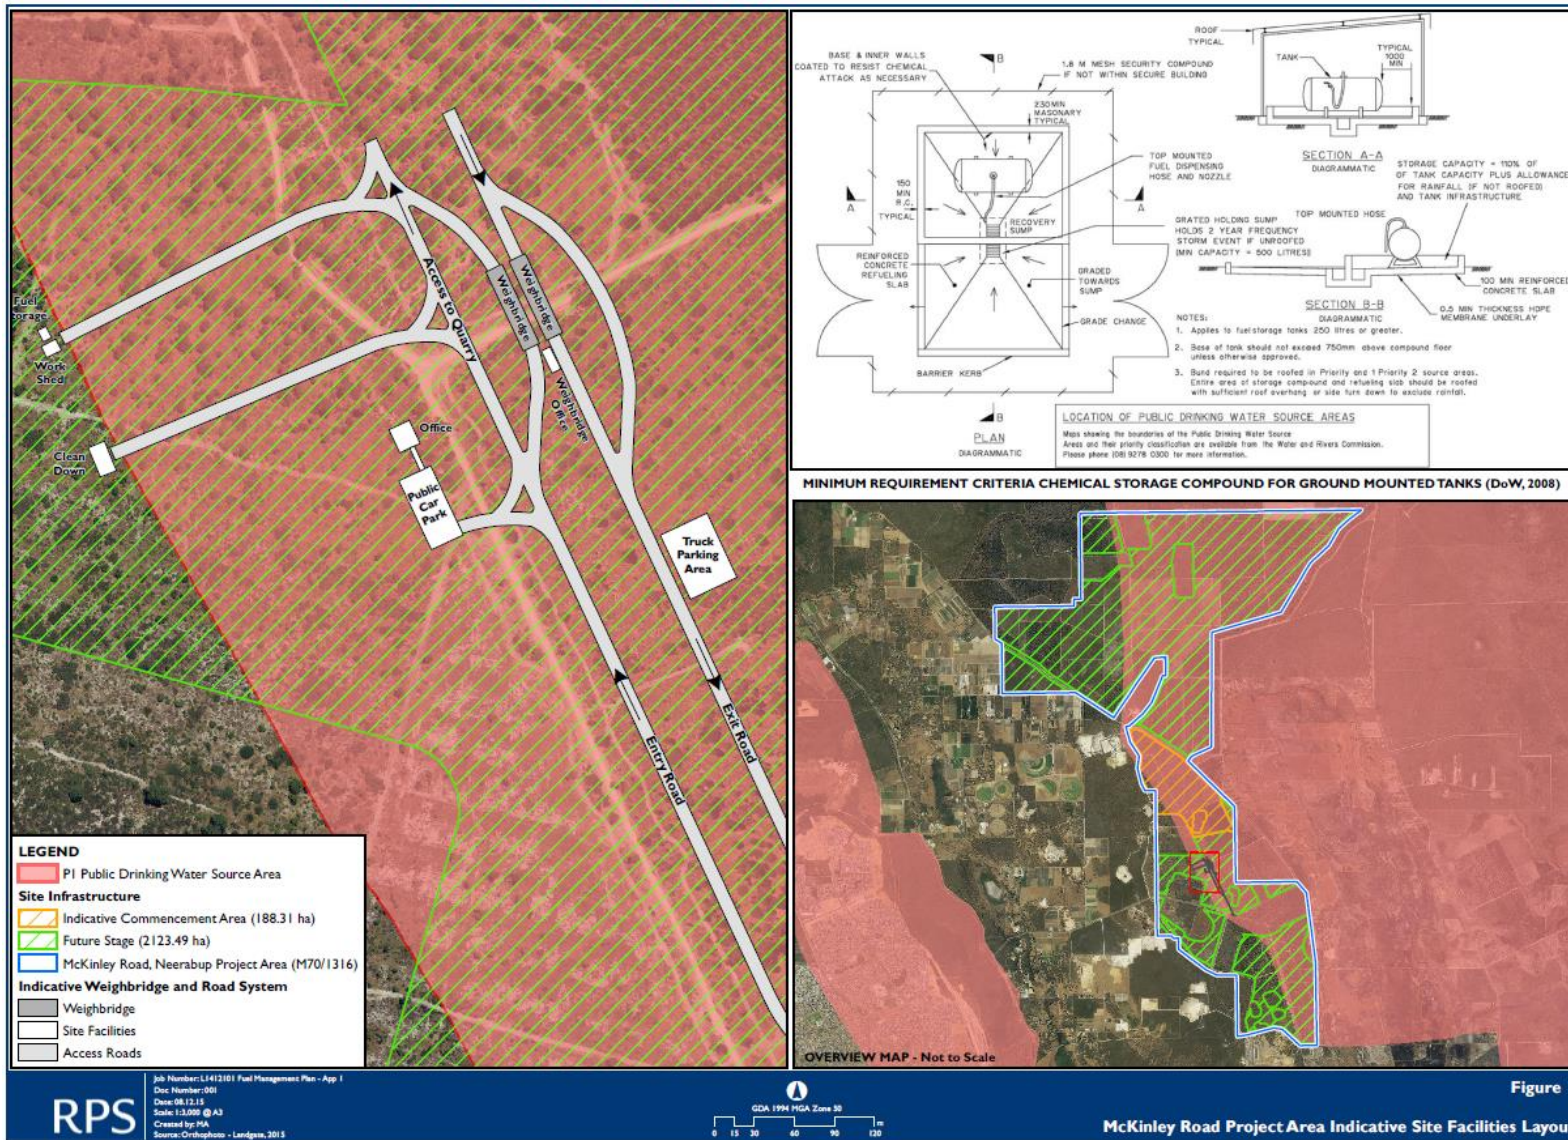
Site Layout showing fuel storage is outside of the Public Drinking Water Source Area
